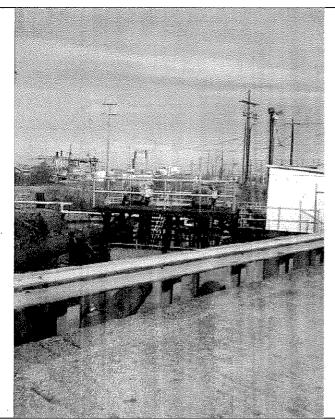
The stormwater pump station from bridge over Washoe Creek. Mill in the background
